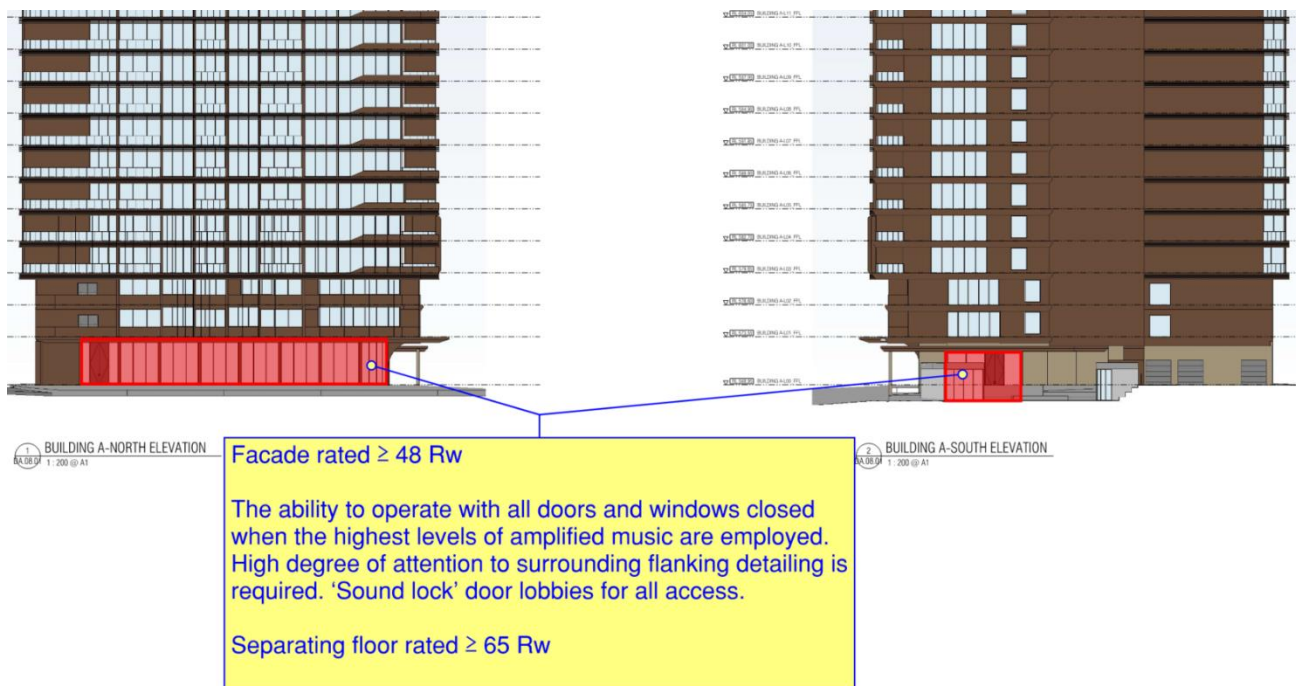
Building A façade construction requirements to mitigate amplified music (85 dBA $L_{10(5-15\text{min})}$) – north and south façade
